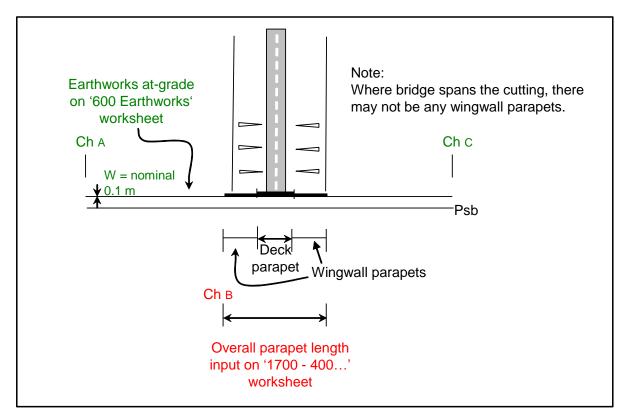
(c) - Parapet and Earthworks Inputs at Underbridge when road at-grade
